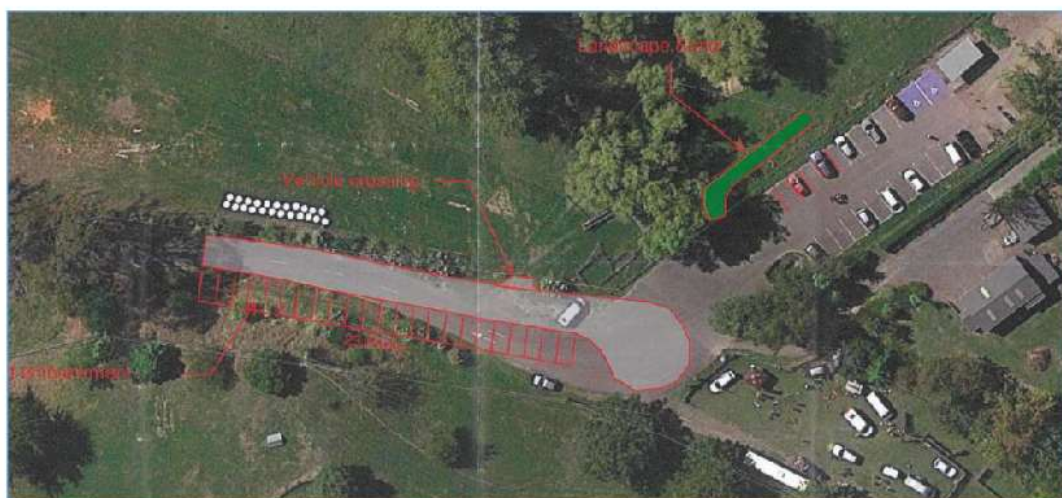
Concept Parking Plan for Tauroa Road (HDC)
